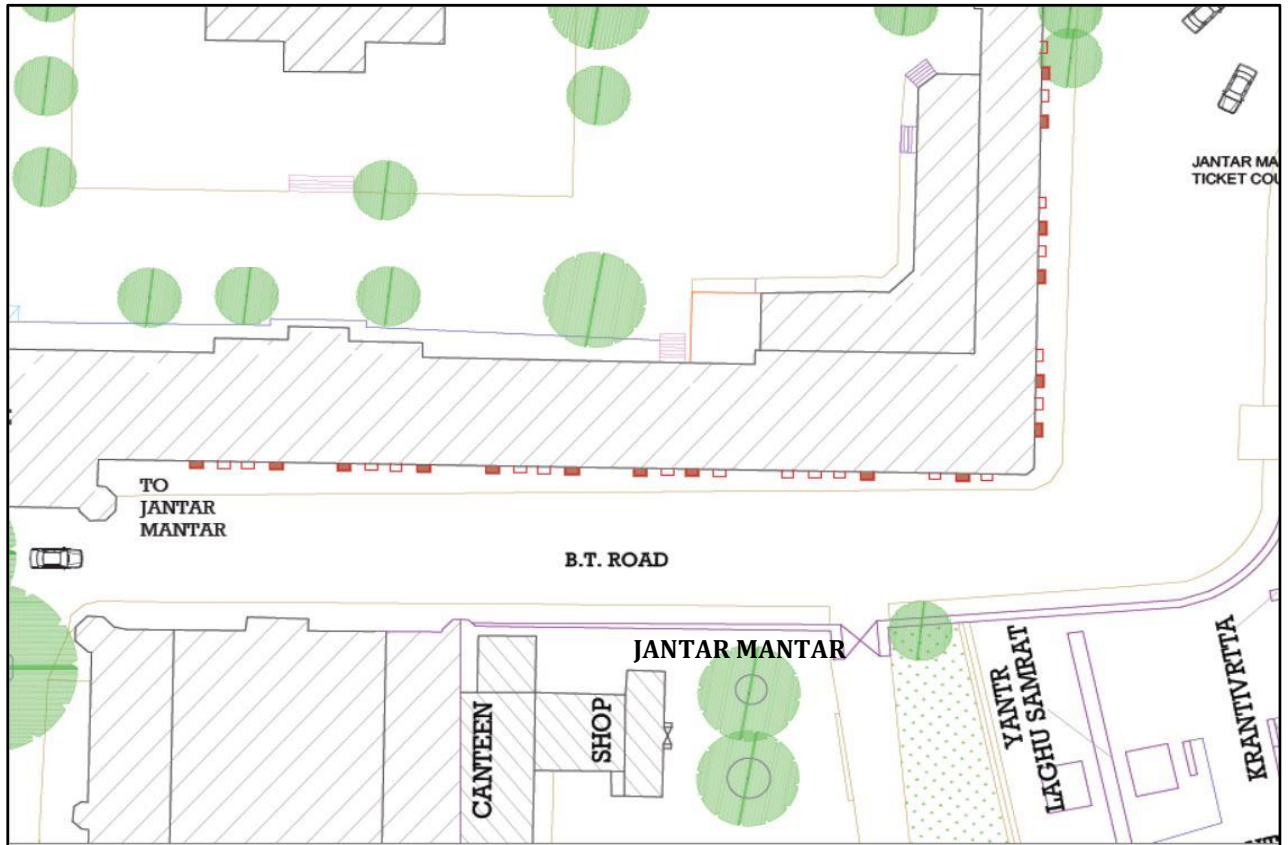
Existing part plan Middle Stretch Between Chandni Chowk and Jantar Mantar
